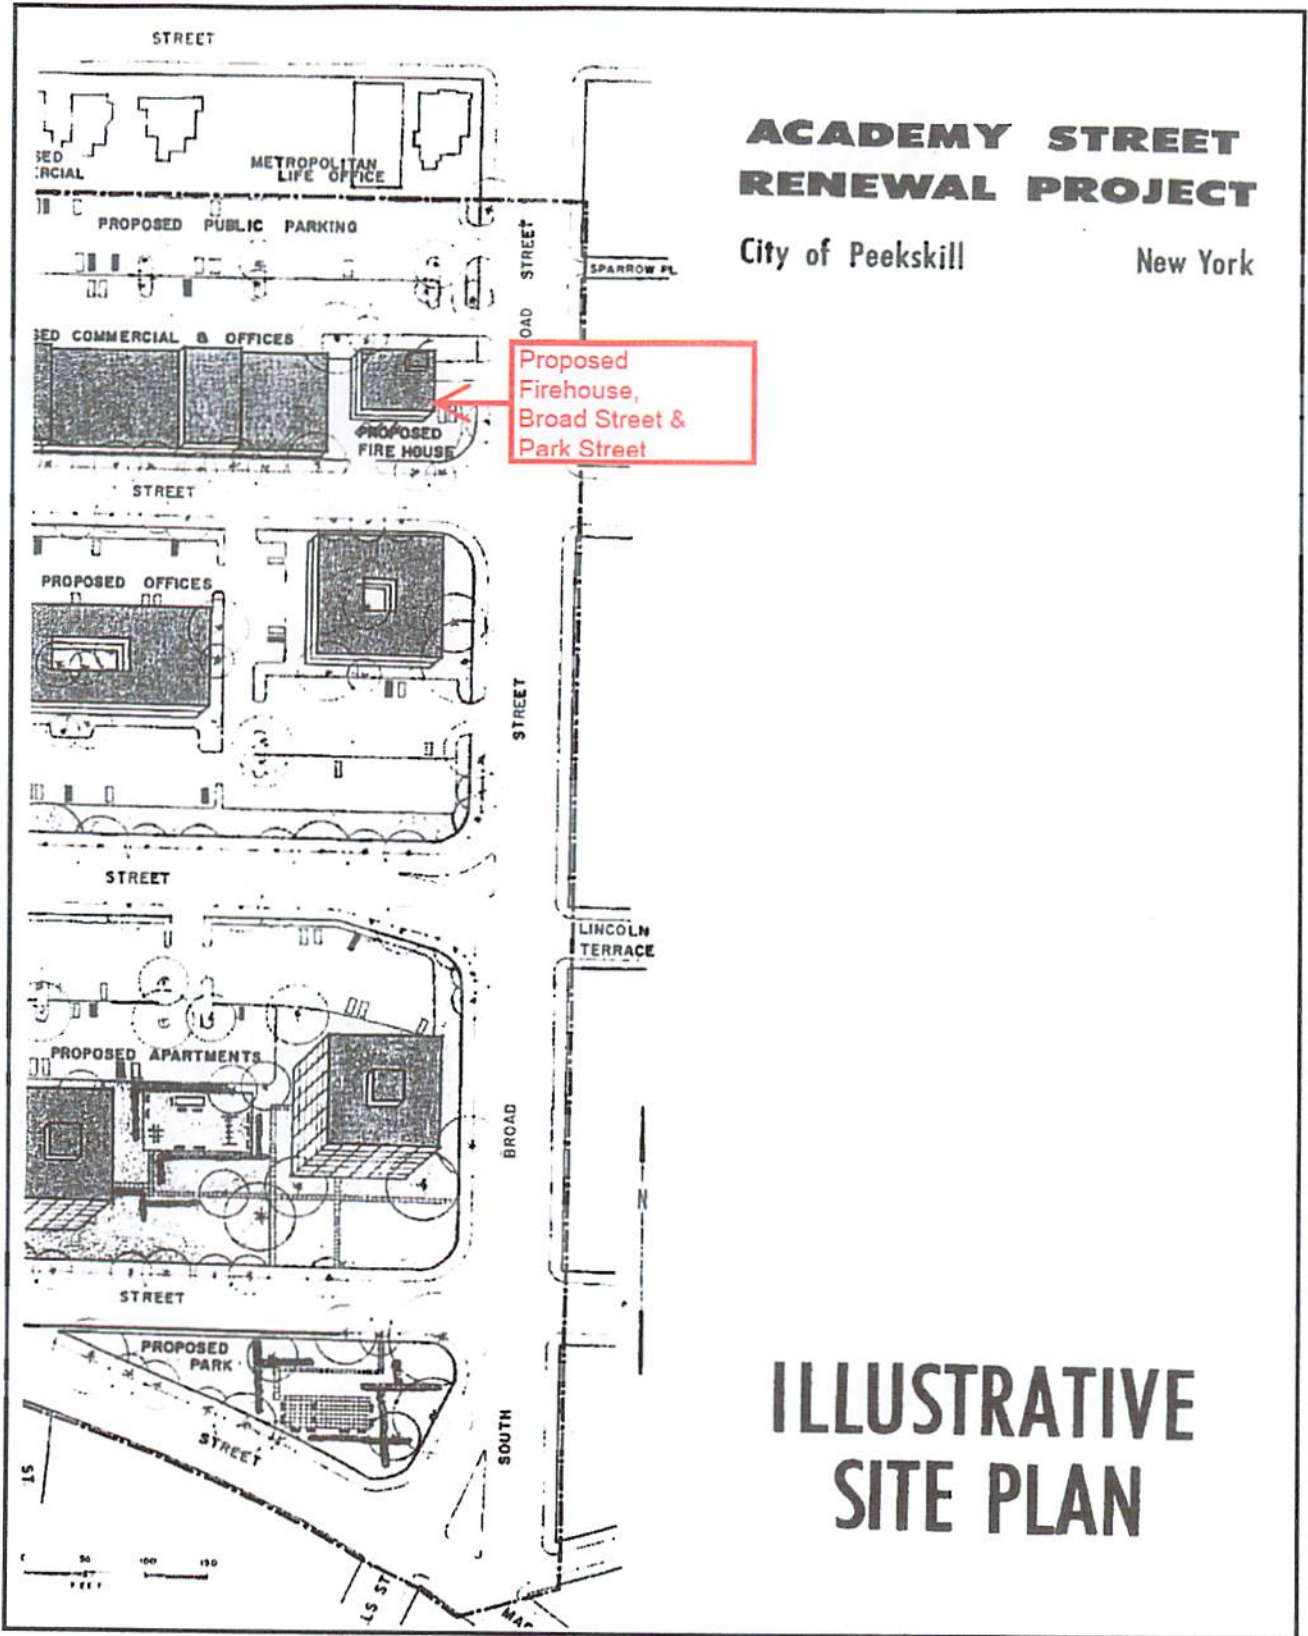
Academy Street Urban Renewal Project, Illustrative Site Plan
